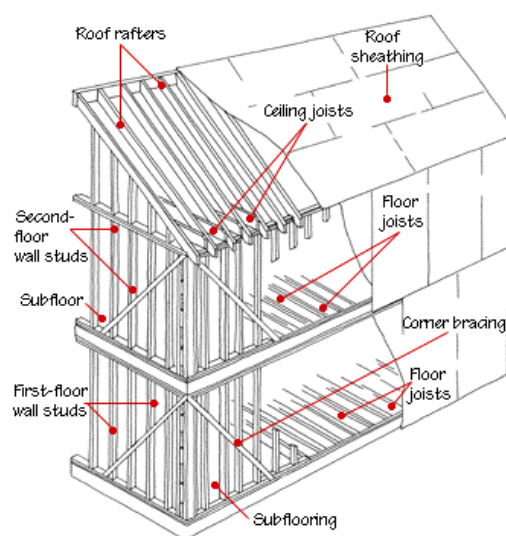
Typical platform framing (source: <http://www.hometips.com>)
